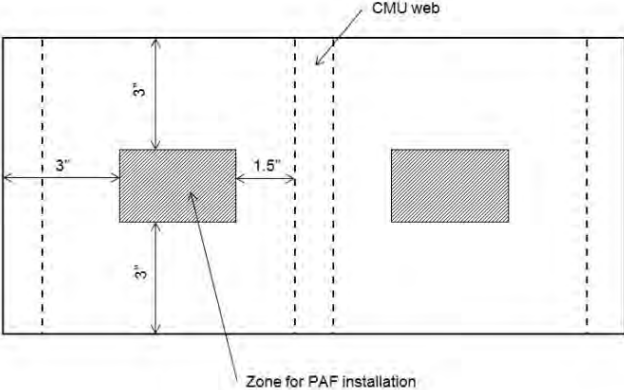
ZONE FOR FASTENER INSTALLATION IN FACE SHELL OF CMU
